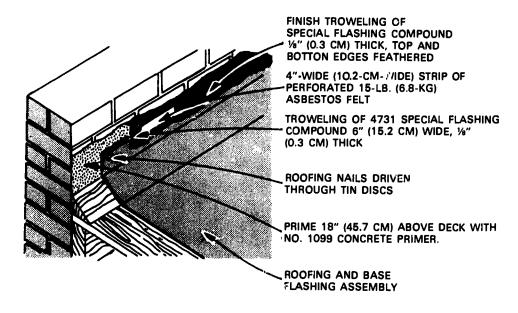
Three-course plastic flashing for concrete walls more than 18 inches (45.7 centimetres) high
